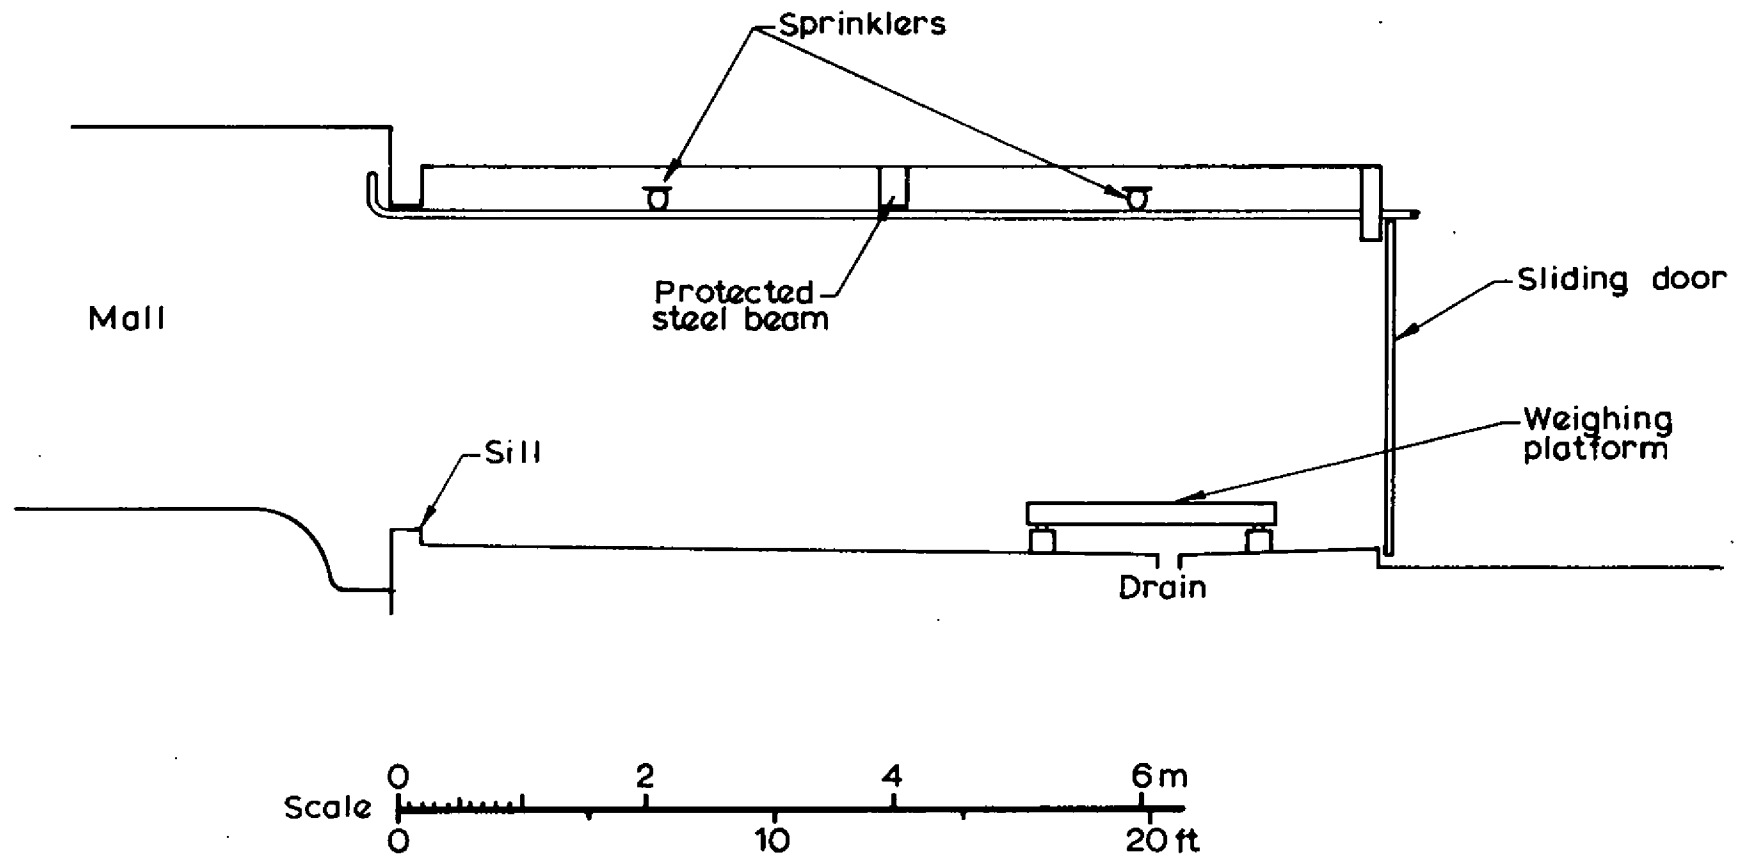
SECTION THROUGH FIRE COMPARTMENT AND MALL
